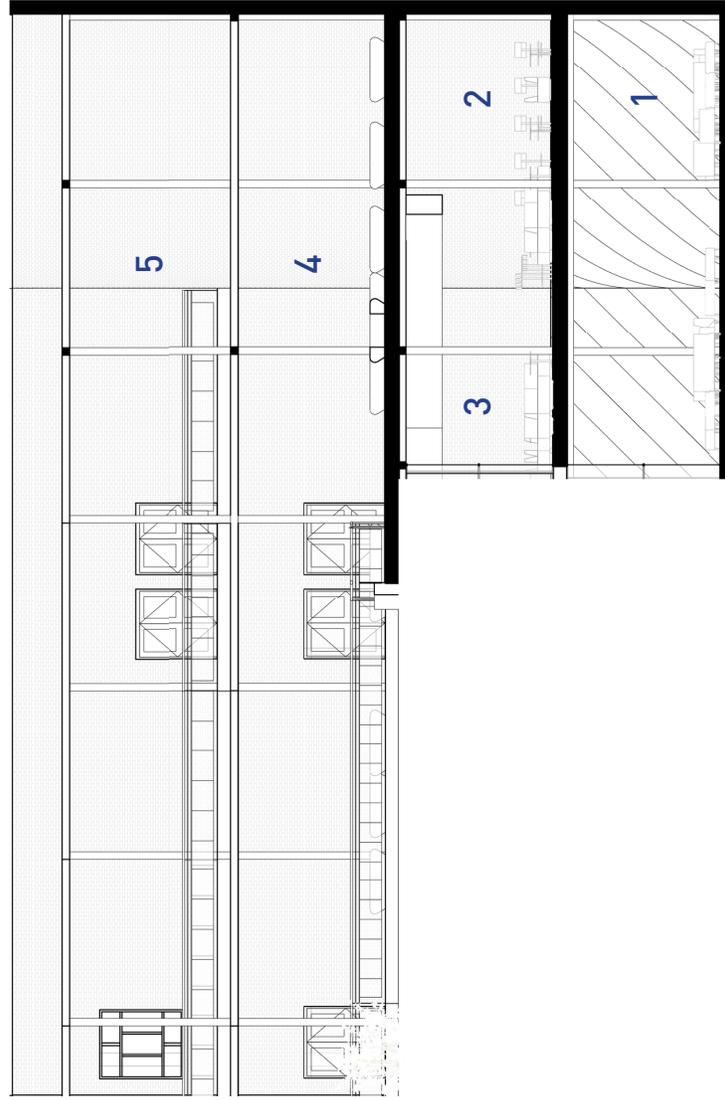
Shared Lobby Interior Elevation Longitudinal
